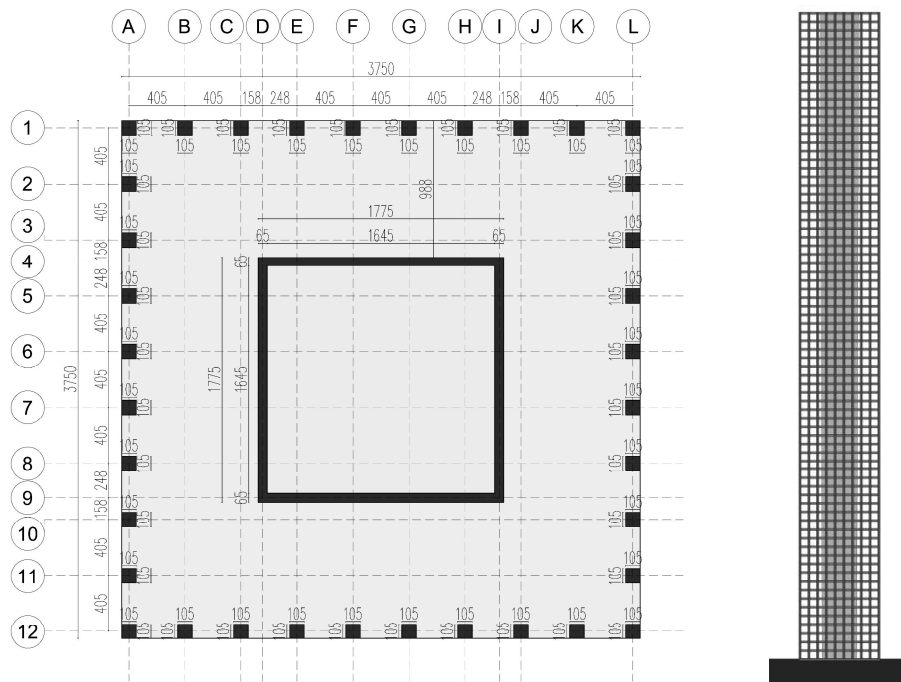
Typical floor plan (left) and elevation (right) of "primary core building" with framed-tube system
